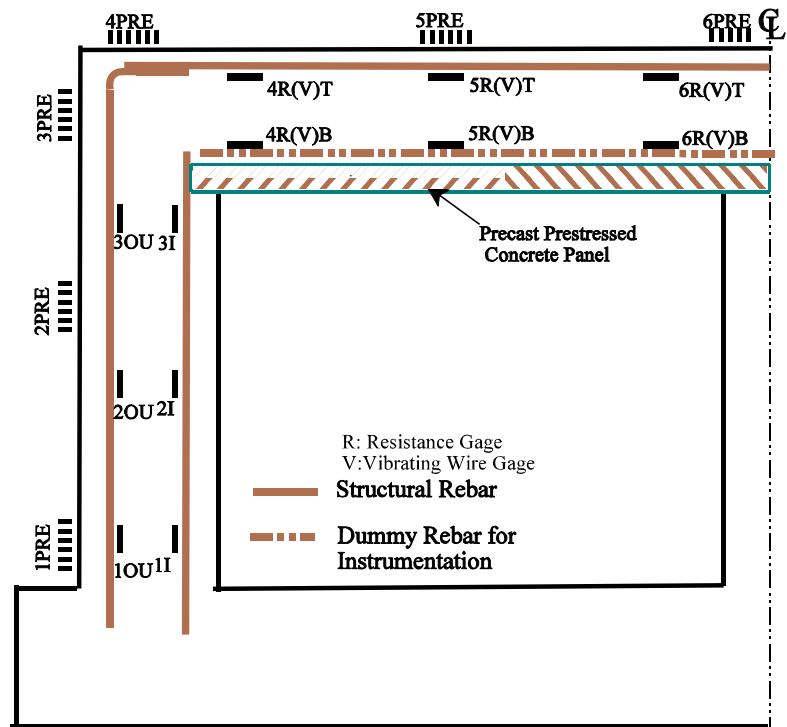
Detailed Illustration of Sullivan Co. Culvert Instrumentation
